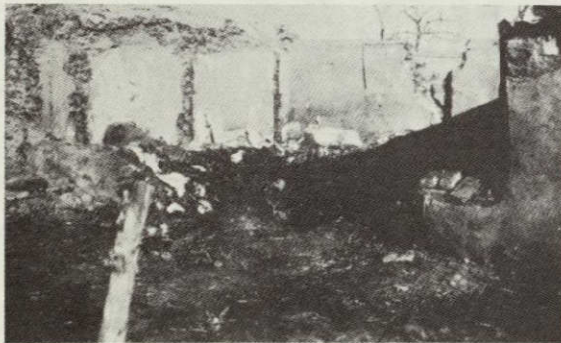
In Kaochiatung, Kaochia Farm in Panchin, buildings with roofs of barley stalks, unbaked mud brick walls and flat roof structure, sank. The beams and the roof sank 1m deep into the ground. There was no evidence of gushed sand or water. The walls seen in this photo belong to the sunken building, but the walls did not sink. (Mag 7 area)
